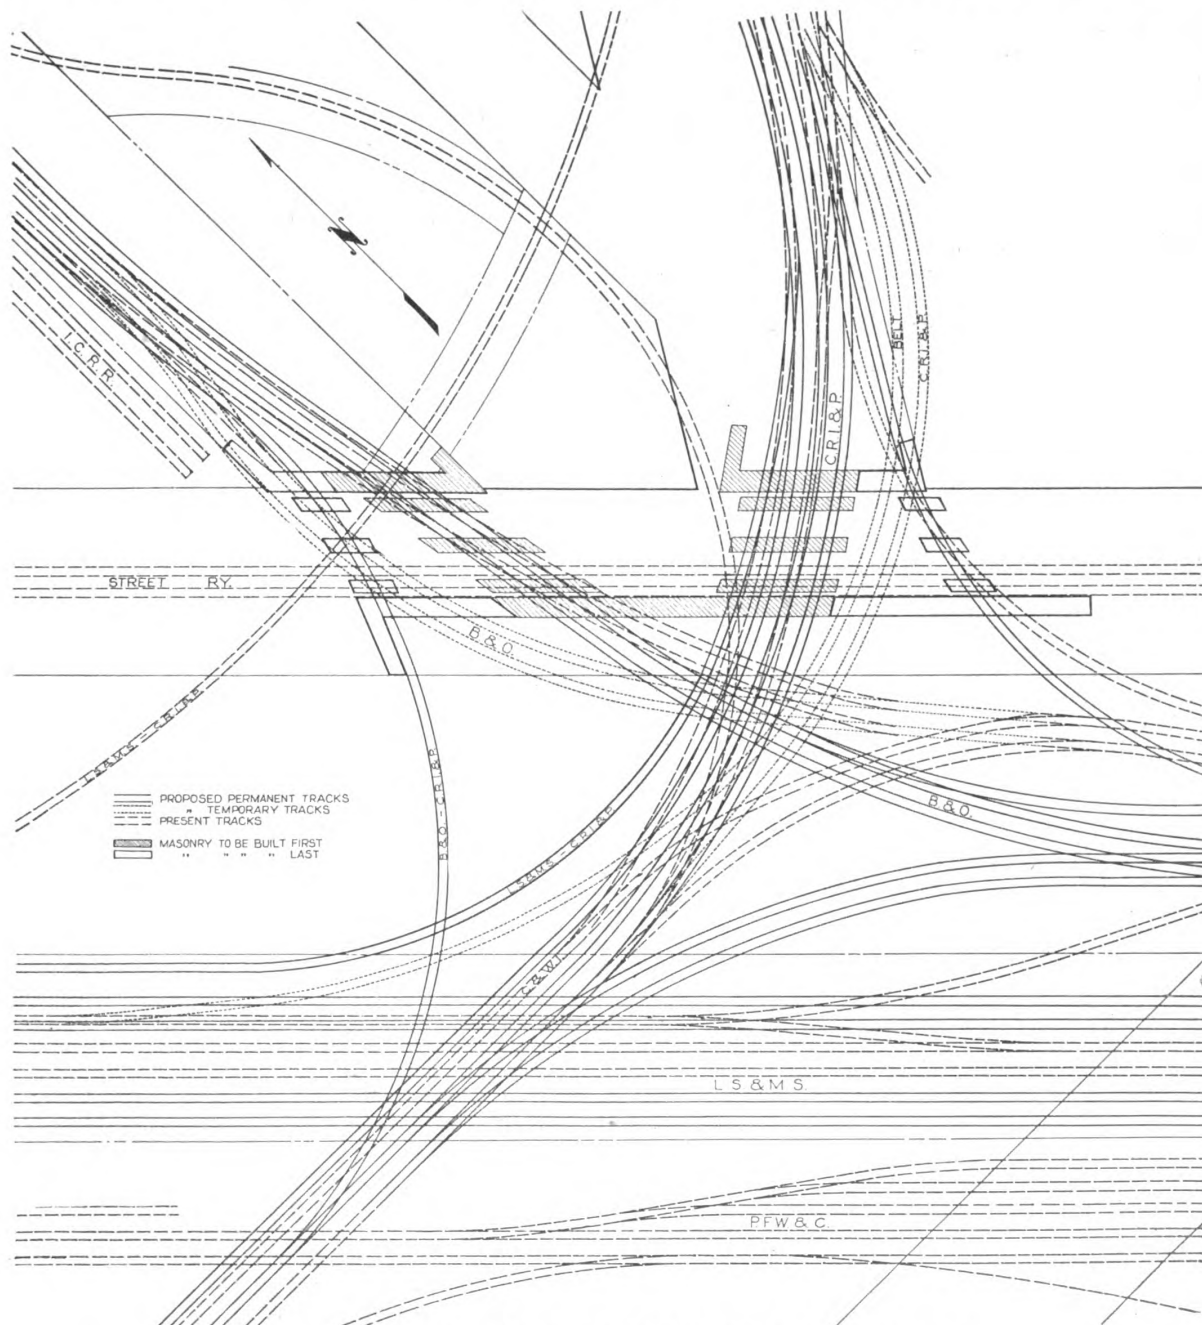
Construction Track Layout at South Chicago Avenue Subway.
